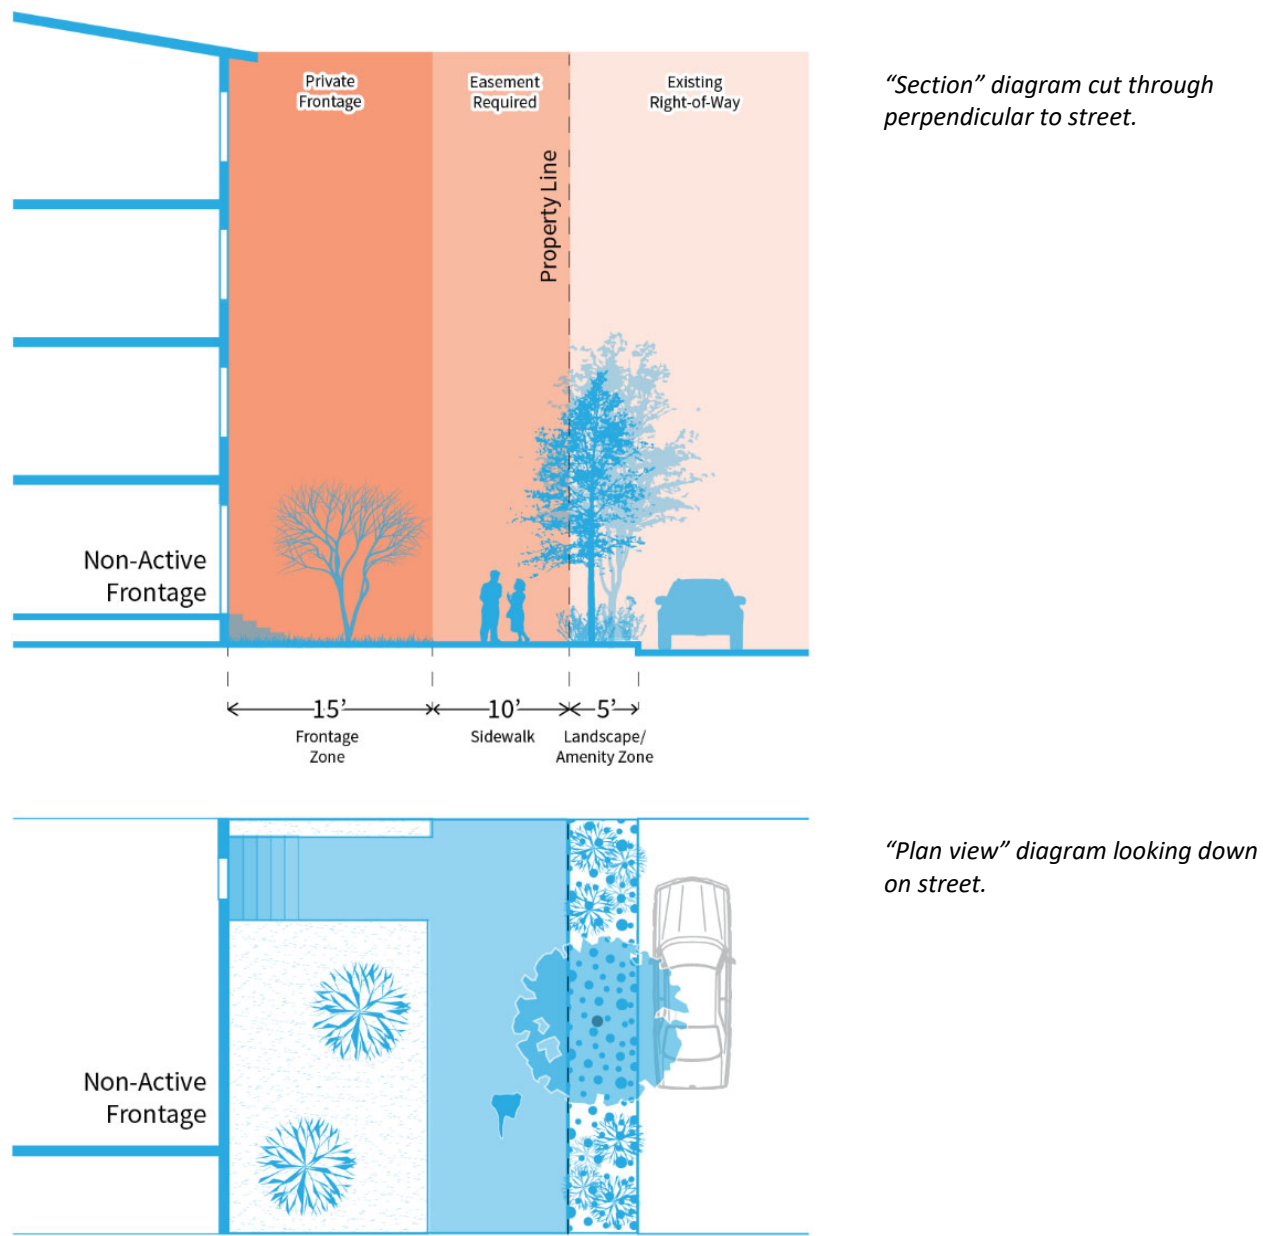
Town Center Street Typology – Non-Active Building Frontage Type
